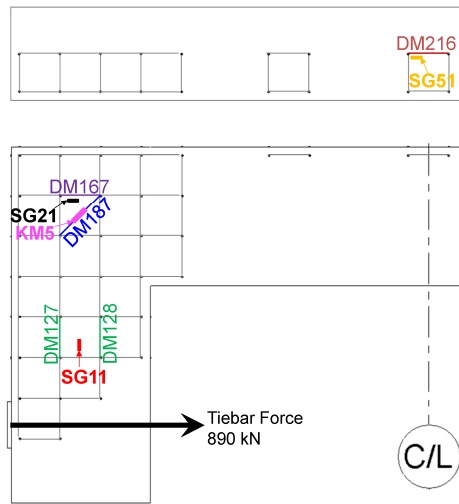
Reinforcing Steel Strains in Compression Zone.
